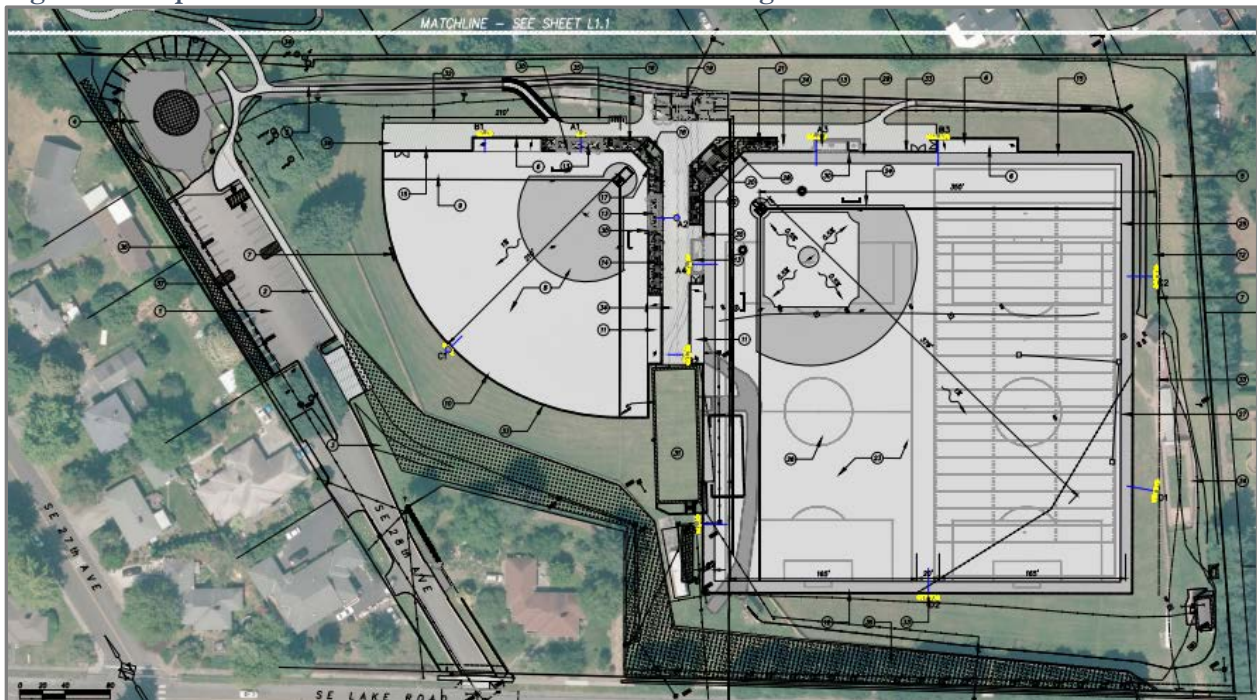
Proposed Athletic Field Refinement Site Plan Along SE Lake Road
